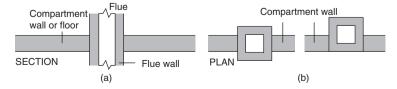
Flues penetrating compartment walls or floors. (a) Flue passing through compartment wall or floor. (b) Flue built into compartment wall
